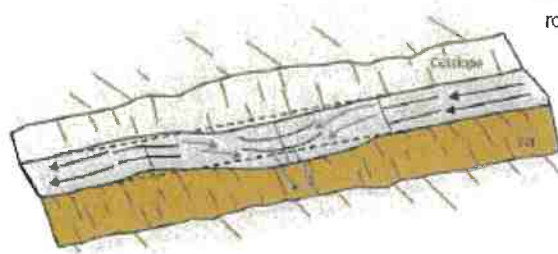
On roads that are to be closed (decommissioned), all stream crossing culverts and fills should be removed. Stream crossing excavations are best performed using an excavator. The original channel should be excavated and exhumed down to the former streambed, with a channel width equal or greater than the natural channel above and below the crossing. Sideslopes should be laid back to a stable angle, typically a 2:1 (50%) gradient, or less. Spoil can be endhauled off-site or stored on the road bench adjacent the crossing, provided it is placed and stabilized where it will not erode or fail and enter the stream.
